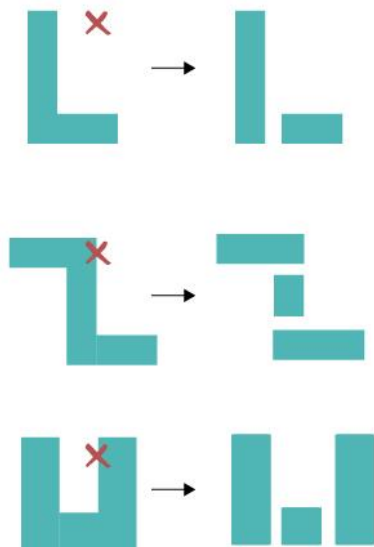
Regular plans are favourable above irregular plans. Dilatations can be provided to avoid irregularity in plan layout (Shock Safe Nepal group 1).
